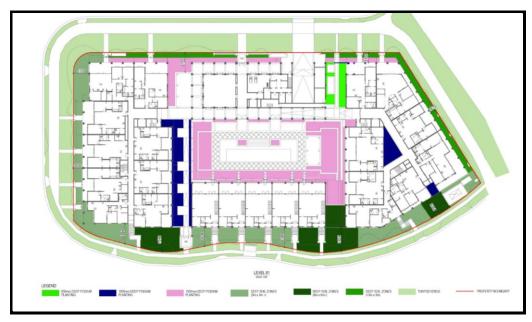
Proposed Landscaping and Podium Planting (Source: Laud ink Dwg DA-L-9031, August 2023
